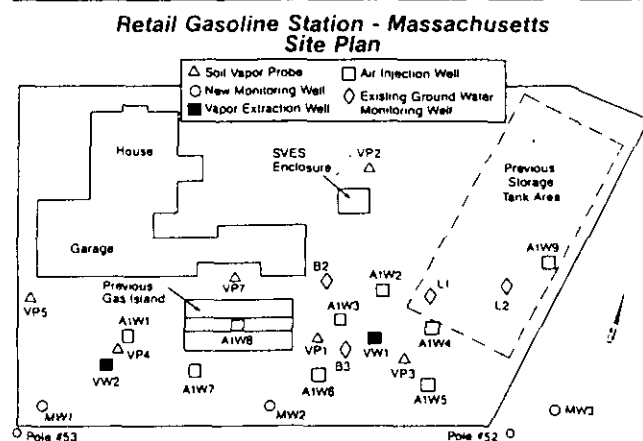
Site plan and SVES/air-sparging system layout retail gasoline station in Massachusetts.
